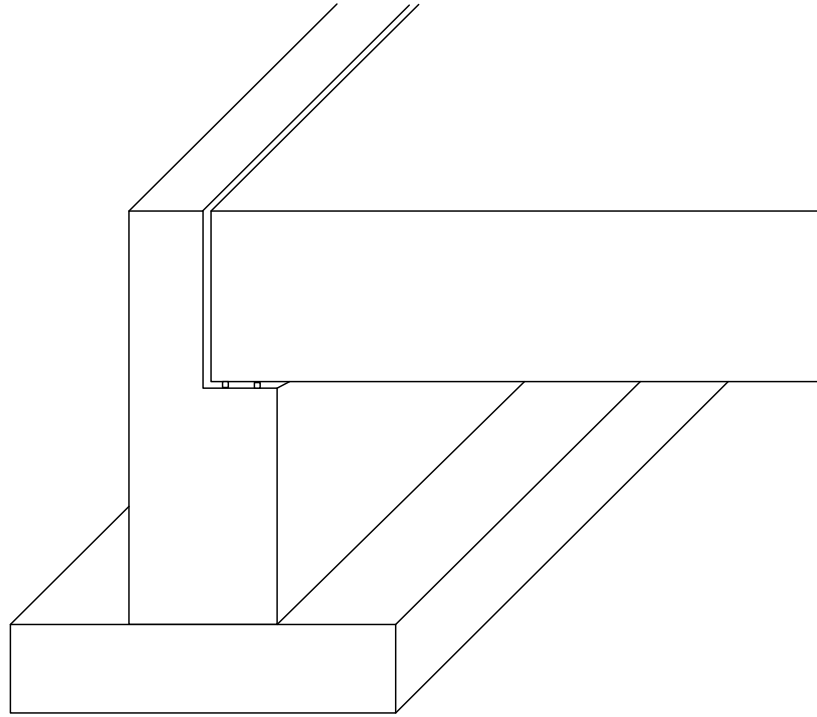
Spread footing with cantilever stemwall at bridge abutment.
